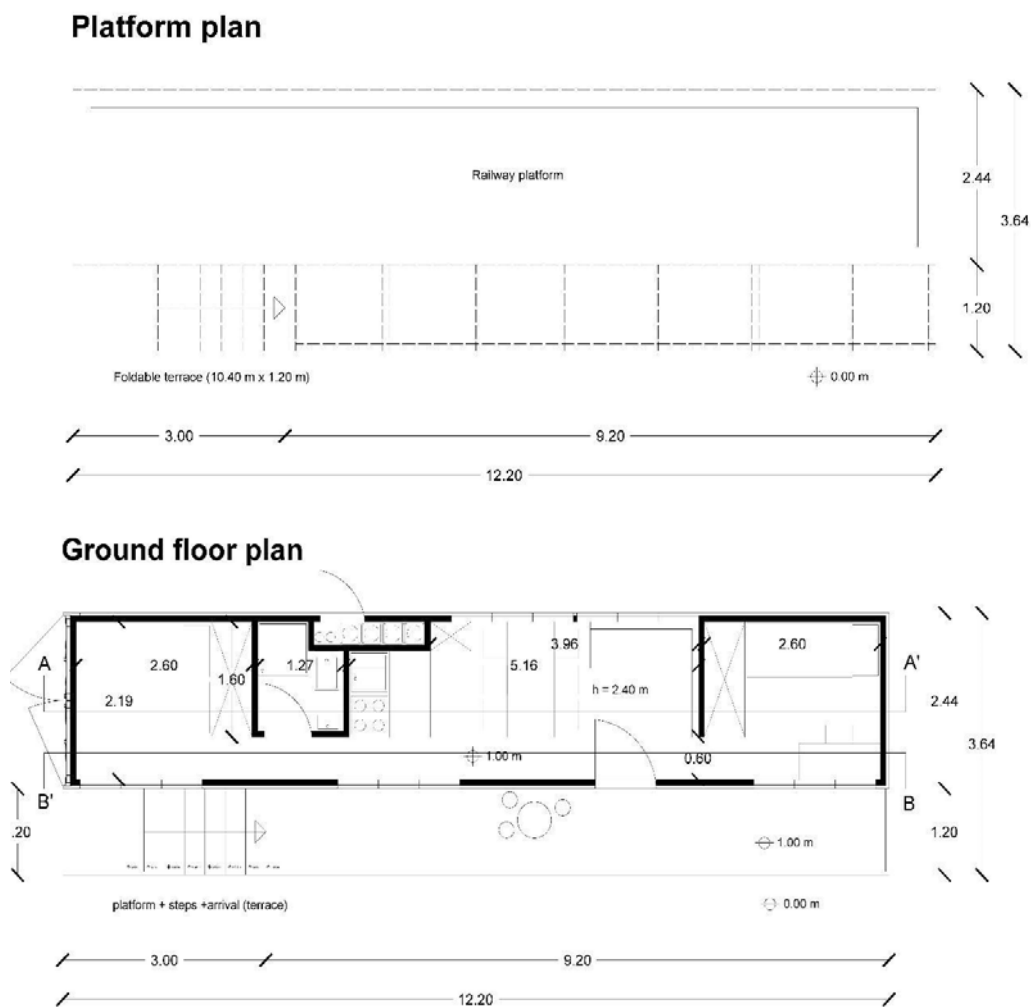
TinyTainer – Floor plans<sup>56</sup>
